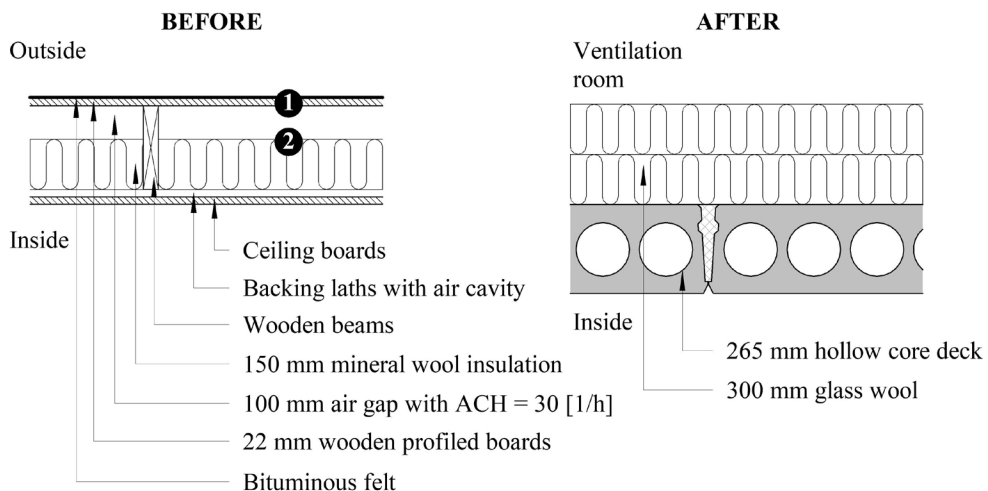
Cross-section view, roof construction, initial and retrofitted state.
